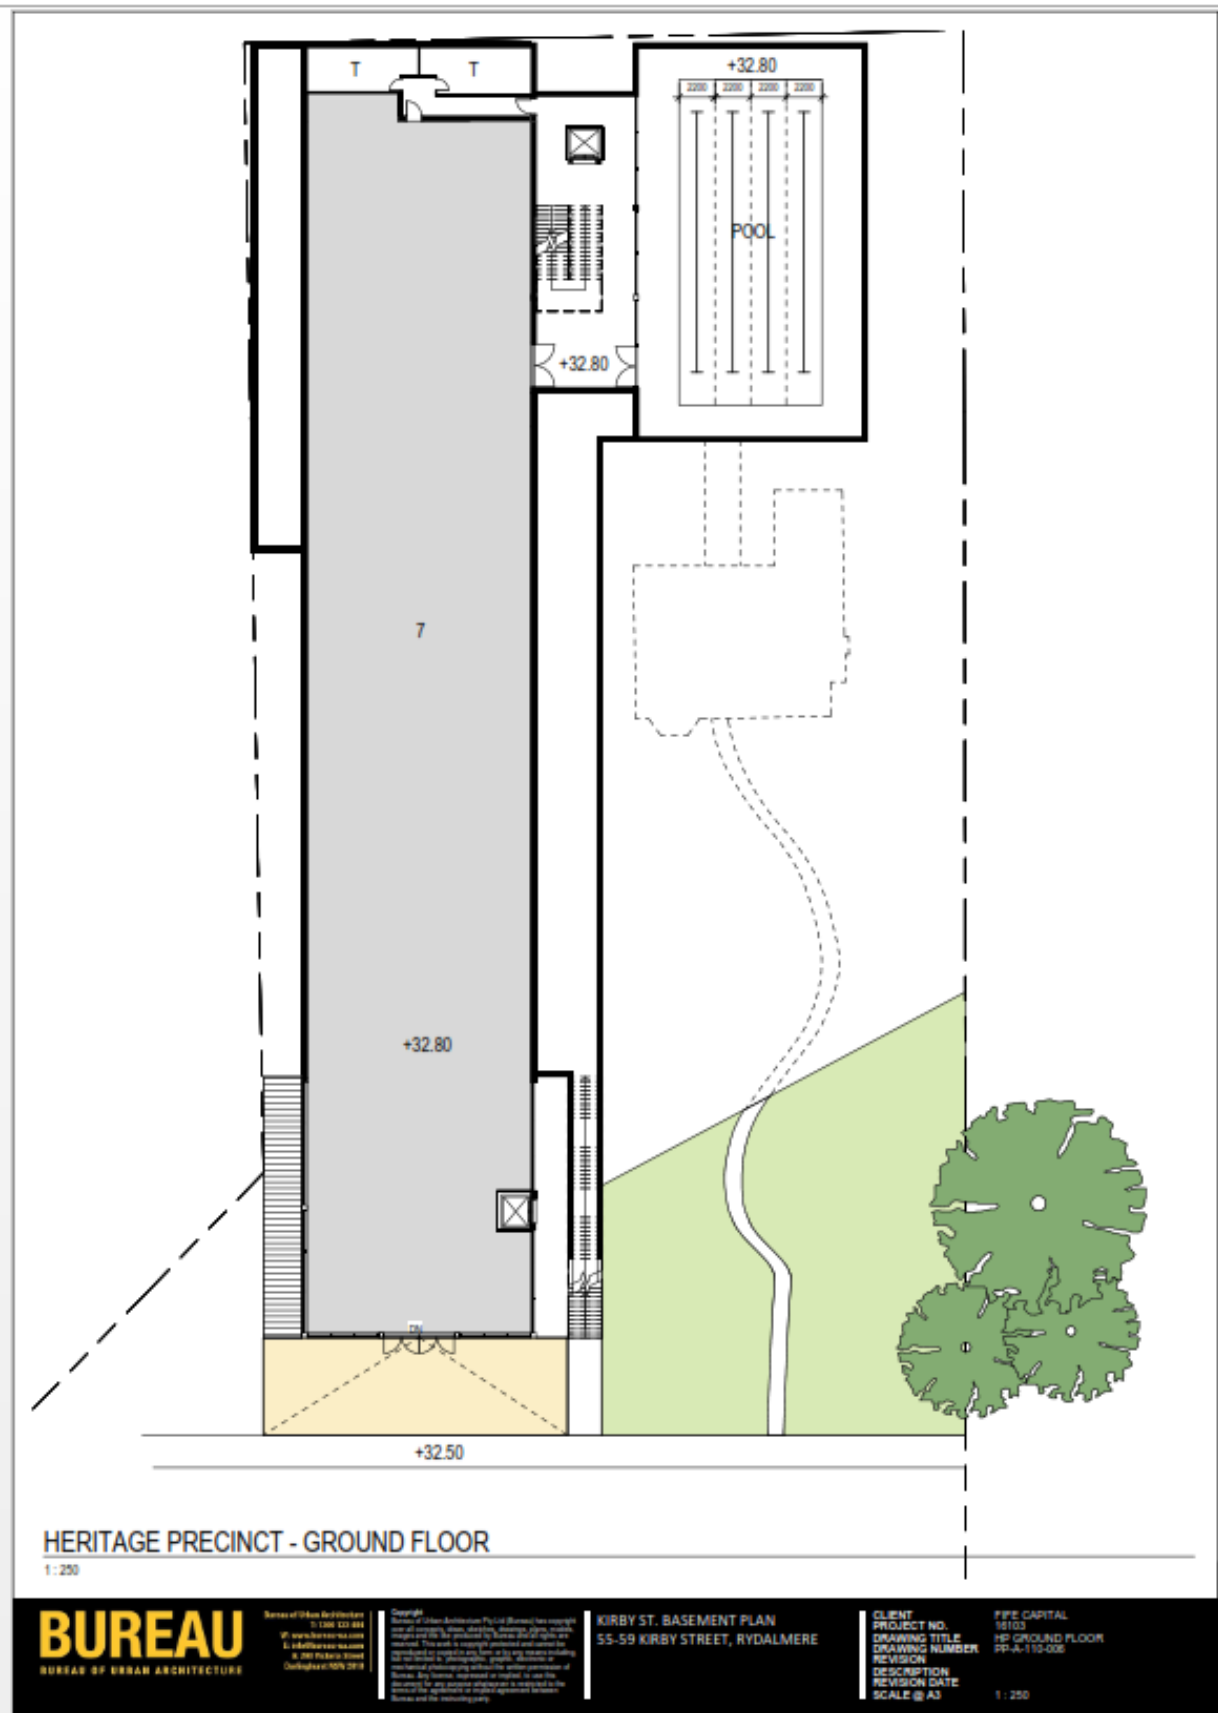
Upjohn House Heritage Precinct – Ground Floor Plan
